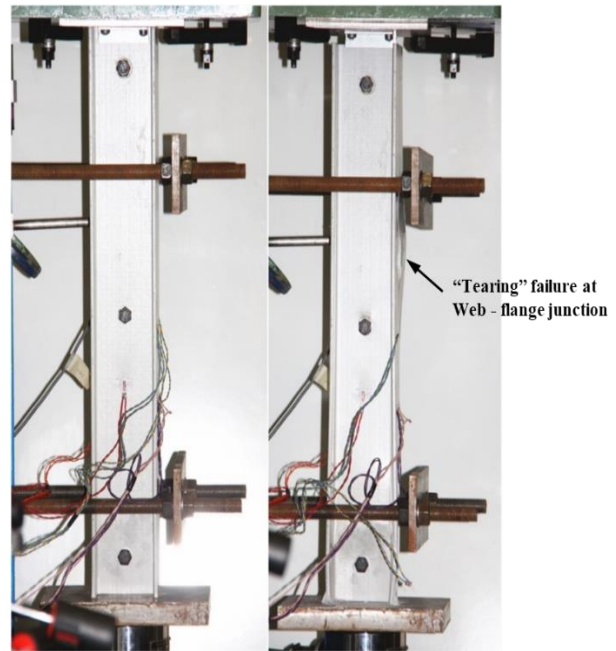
Local buckling test on C2 specimen: (a) under compression; (b) local buckling failure.
